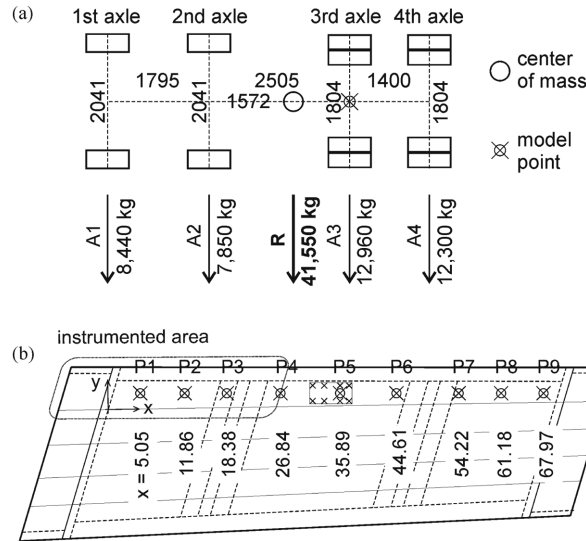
Proof loading associated details: (a) Geometrical configuration and axle load distribution of the proof loading vehicles and (b) static proof loading positions of the vehicles along lane 1 of the bridge system S33.24
